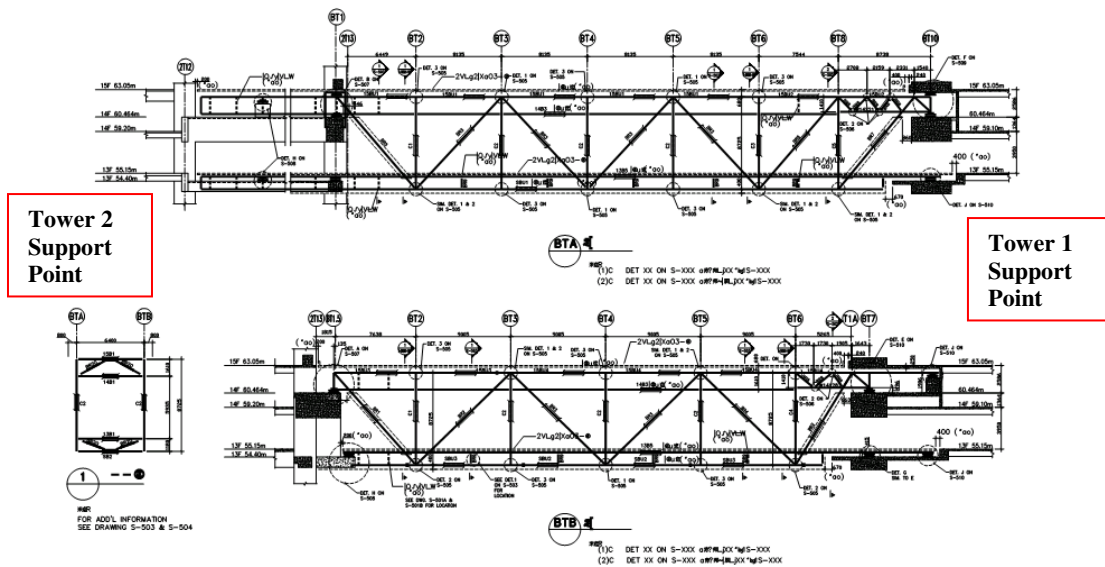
BRIDGE TRUSS ELEVATIONS
